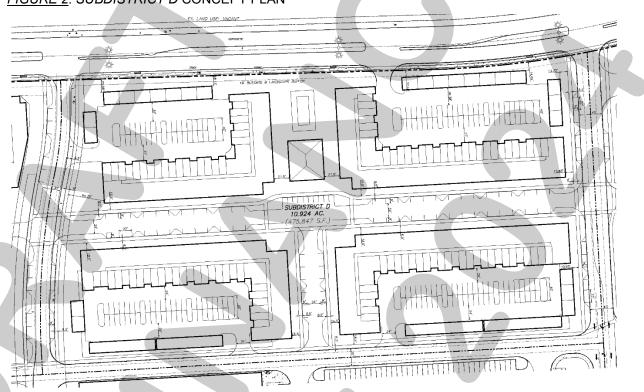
SUBDISTRICT D CONCEPT PLAN
